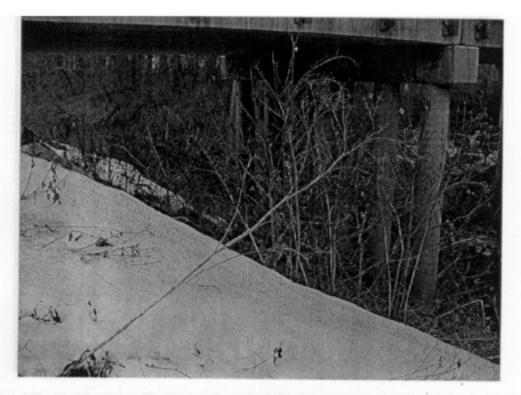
West bank along Richland Creek looking north near Schueten German Rd. bridge.
